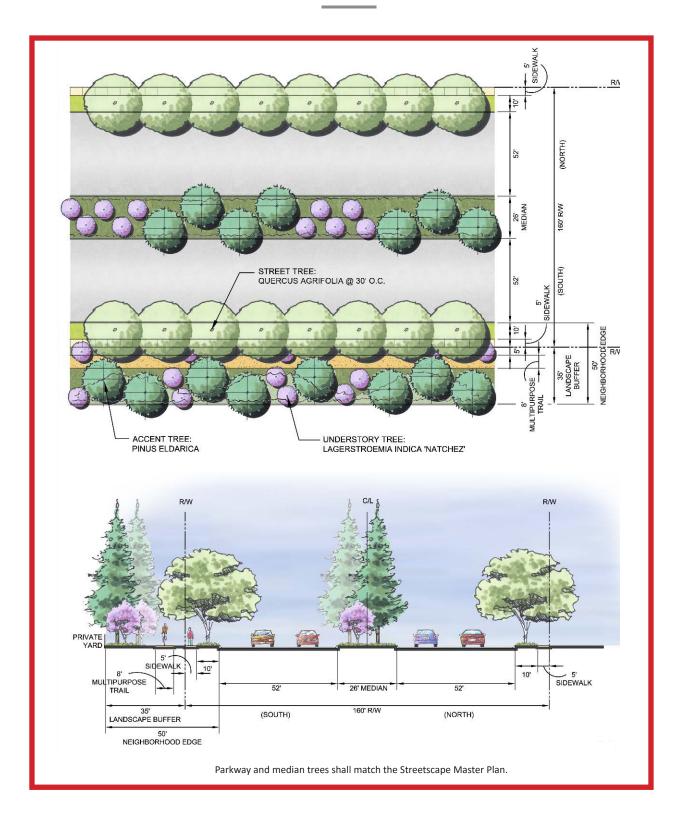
Ontario Ranch Rd. Streetscape
